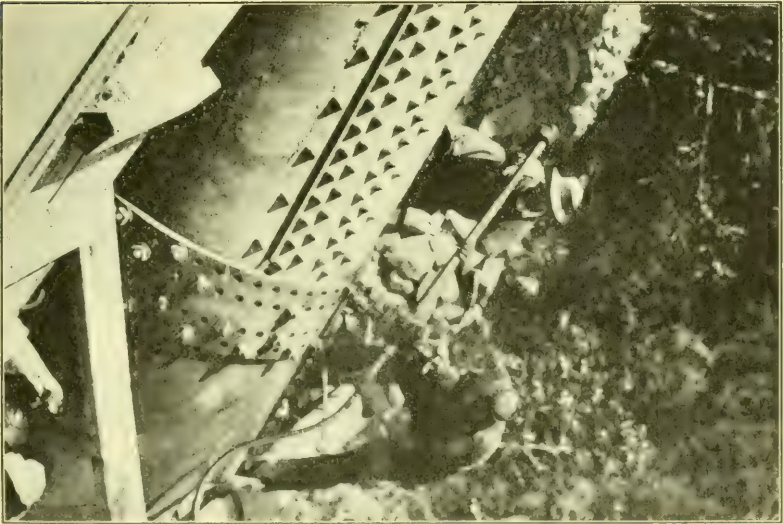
DETAIL OF PENSTOCK, DURING CONSTRUCTION.
